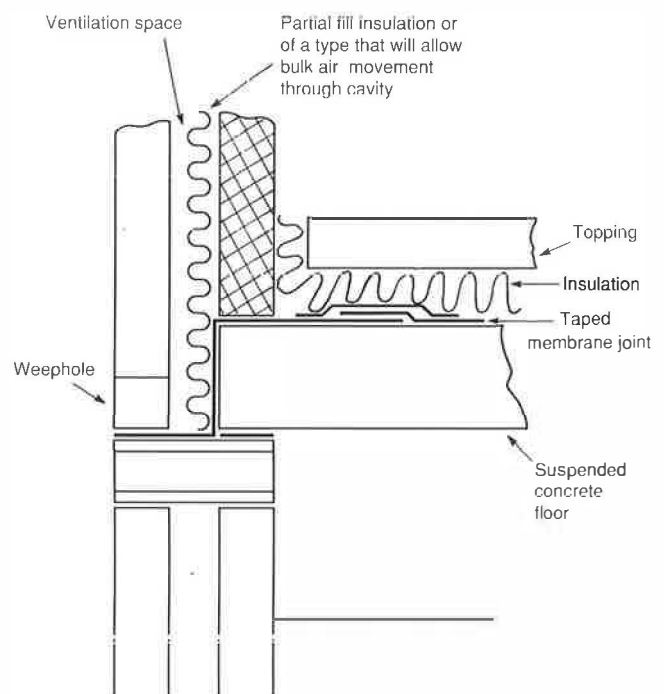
Avoidance of a slip plane within the wall by positioning the membrane joint over the floor
